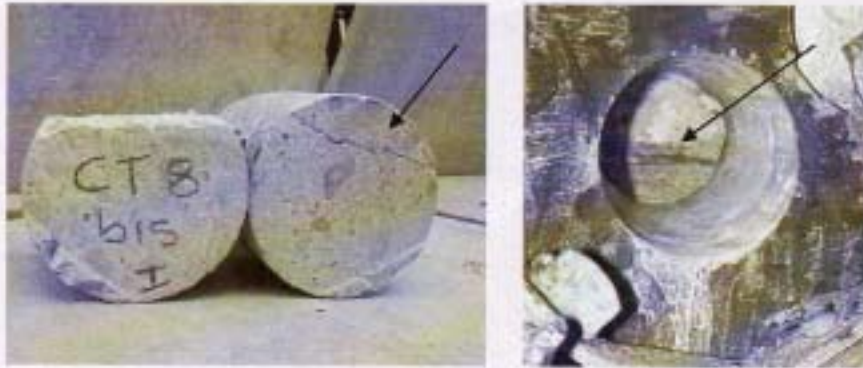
Evidence of a longitudinal crack on concrete cored from a beam
